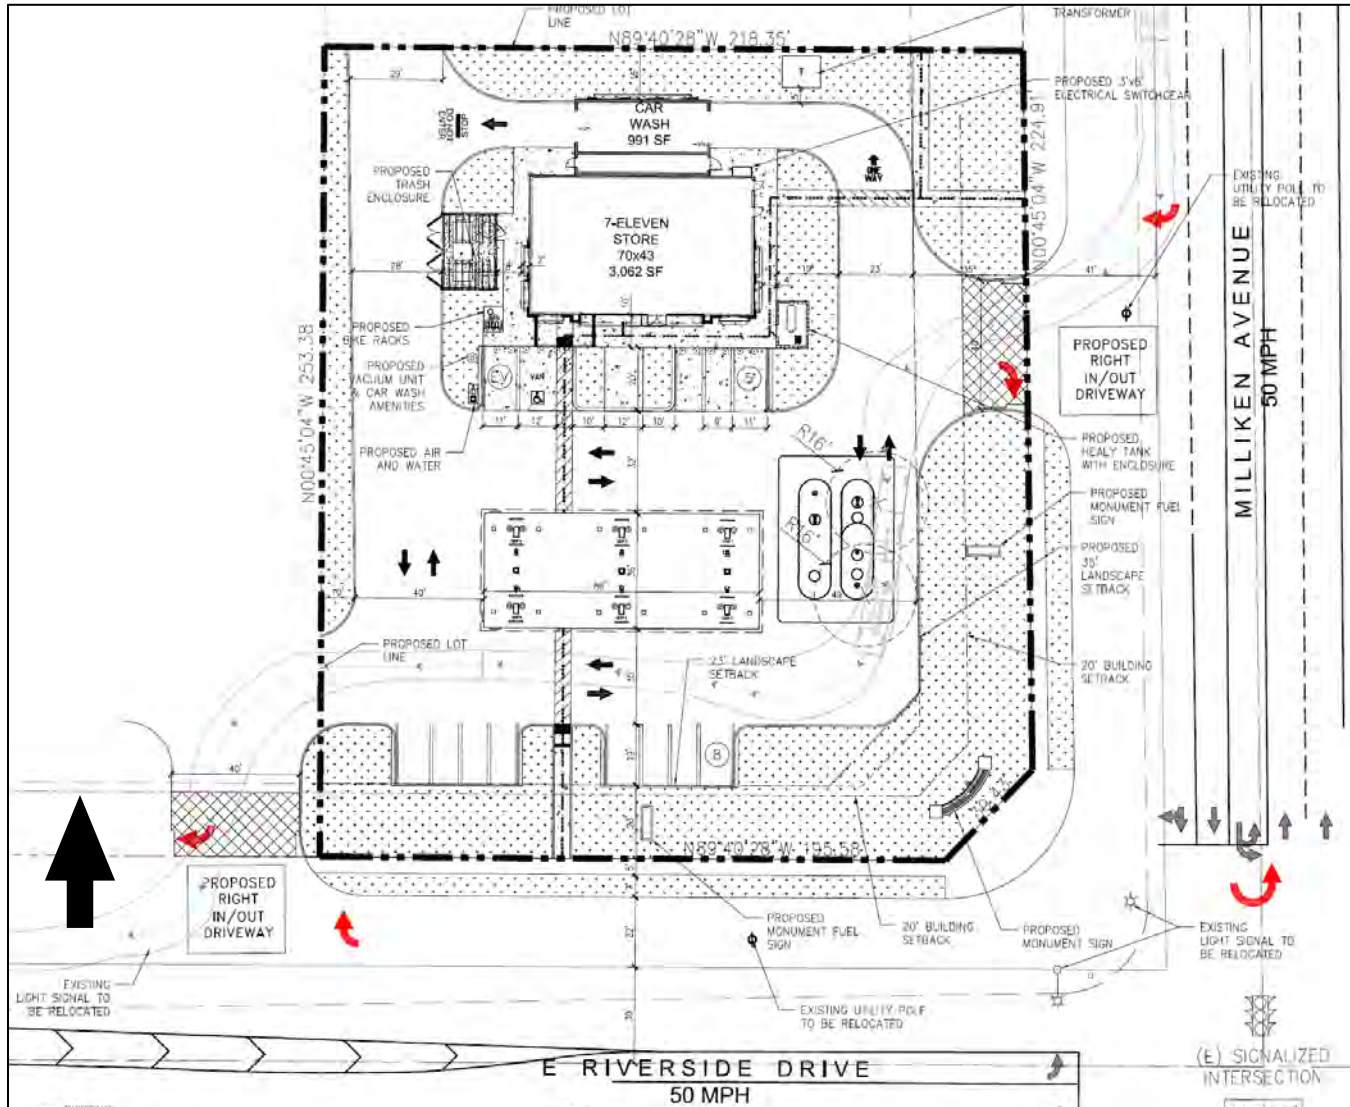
7-ELEVEN CONVENIENCE STORE FLOOR PLAN
